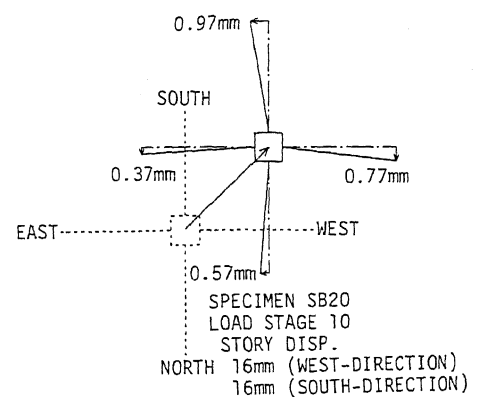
Horizontal Beam Deflection under Bidirectional Loading
